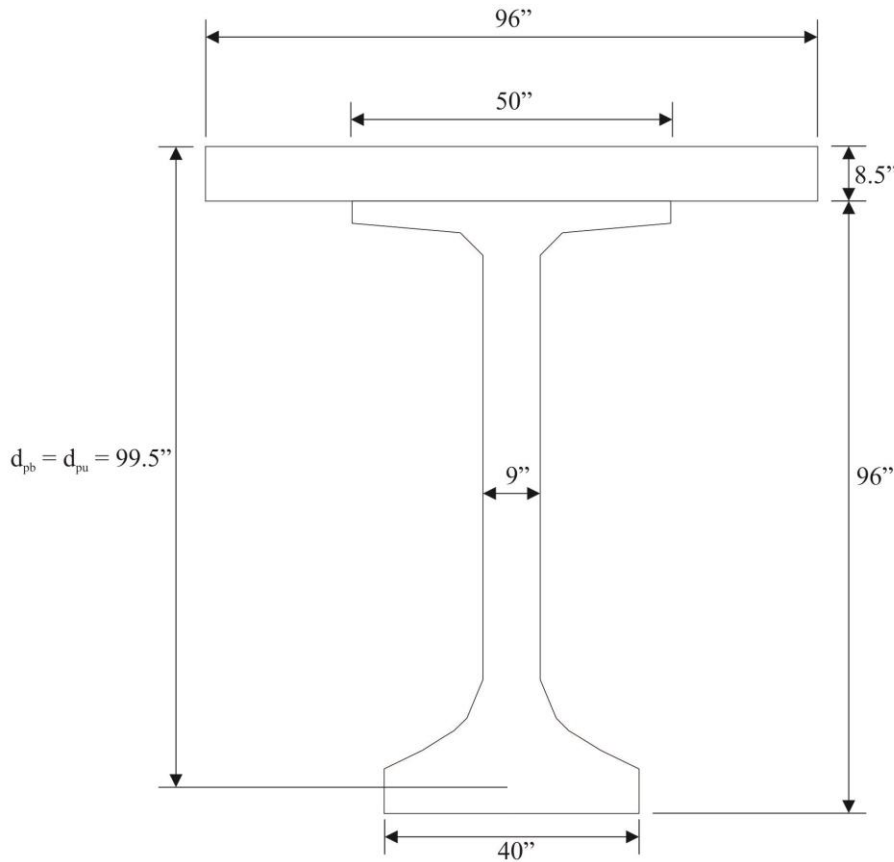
Cross-sectional dimensions: Modified FIB-96
